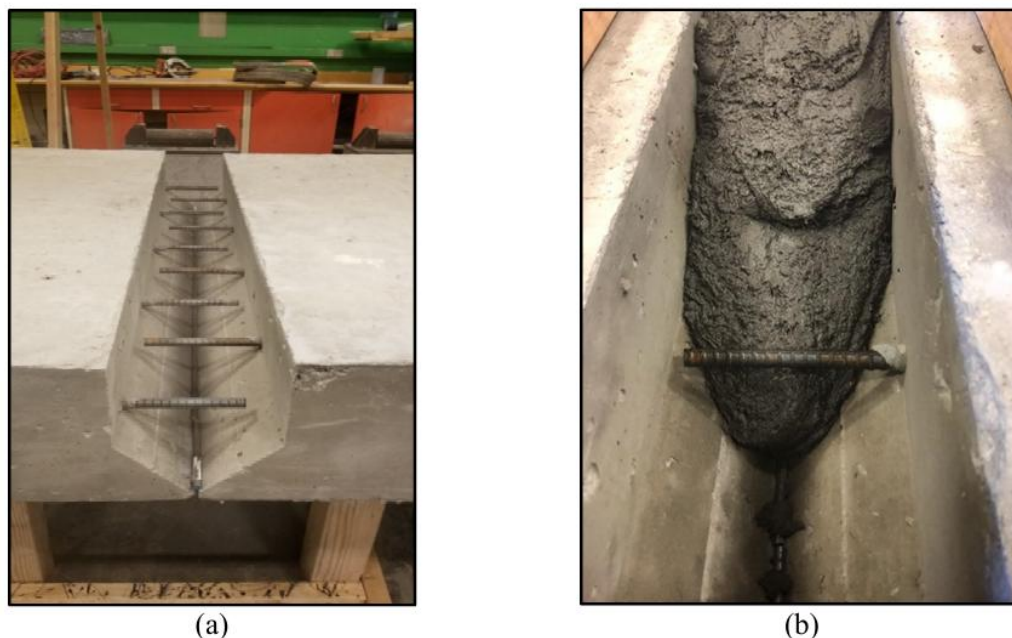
View of experimental joint - a) prior to casting; b) during casting; (UHPC Phase IV, Figure 5.13)
